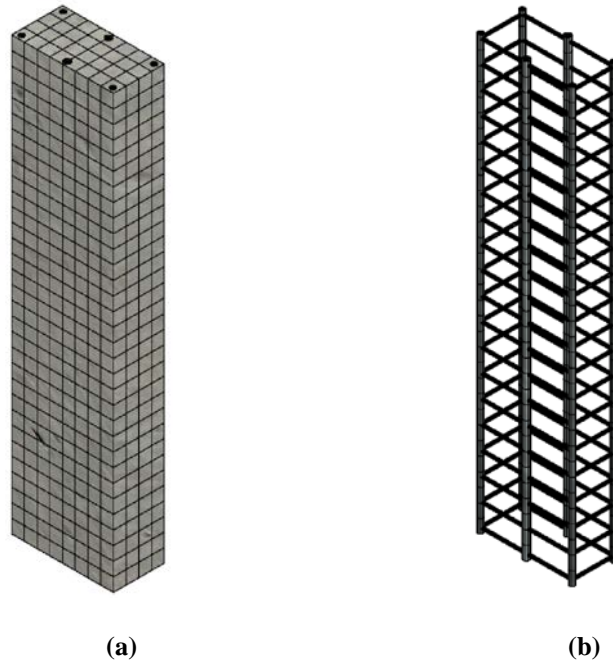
(a) 3D model for column, (b) 3D model for the column reinforcement
